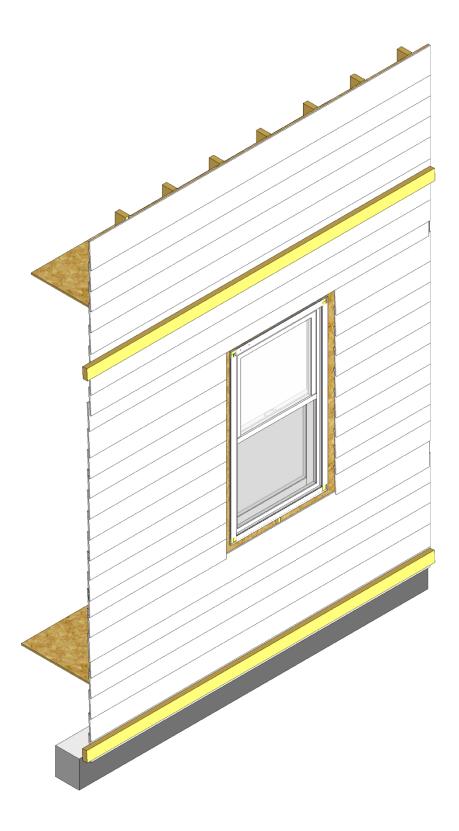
Step 2: Remove the existing window trim, and fasten the ledger boards through the existing exterior cladding and sheathing.
